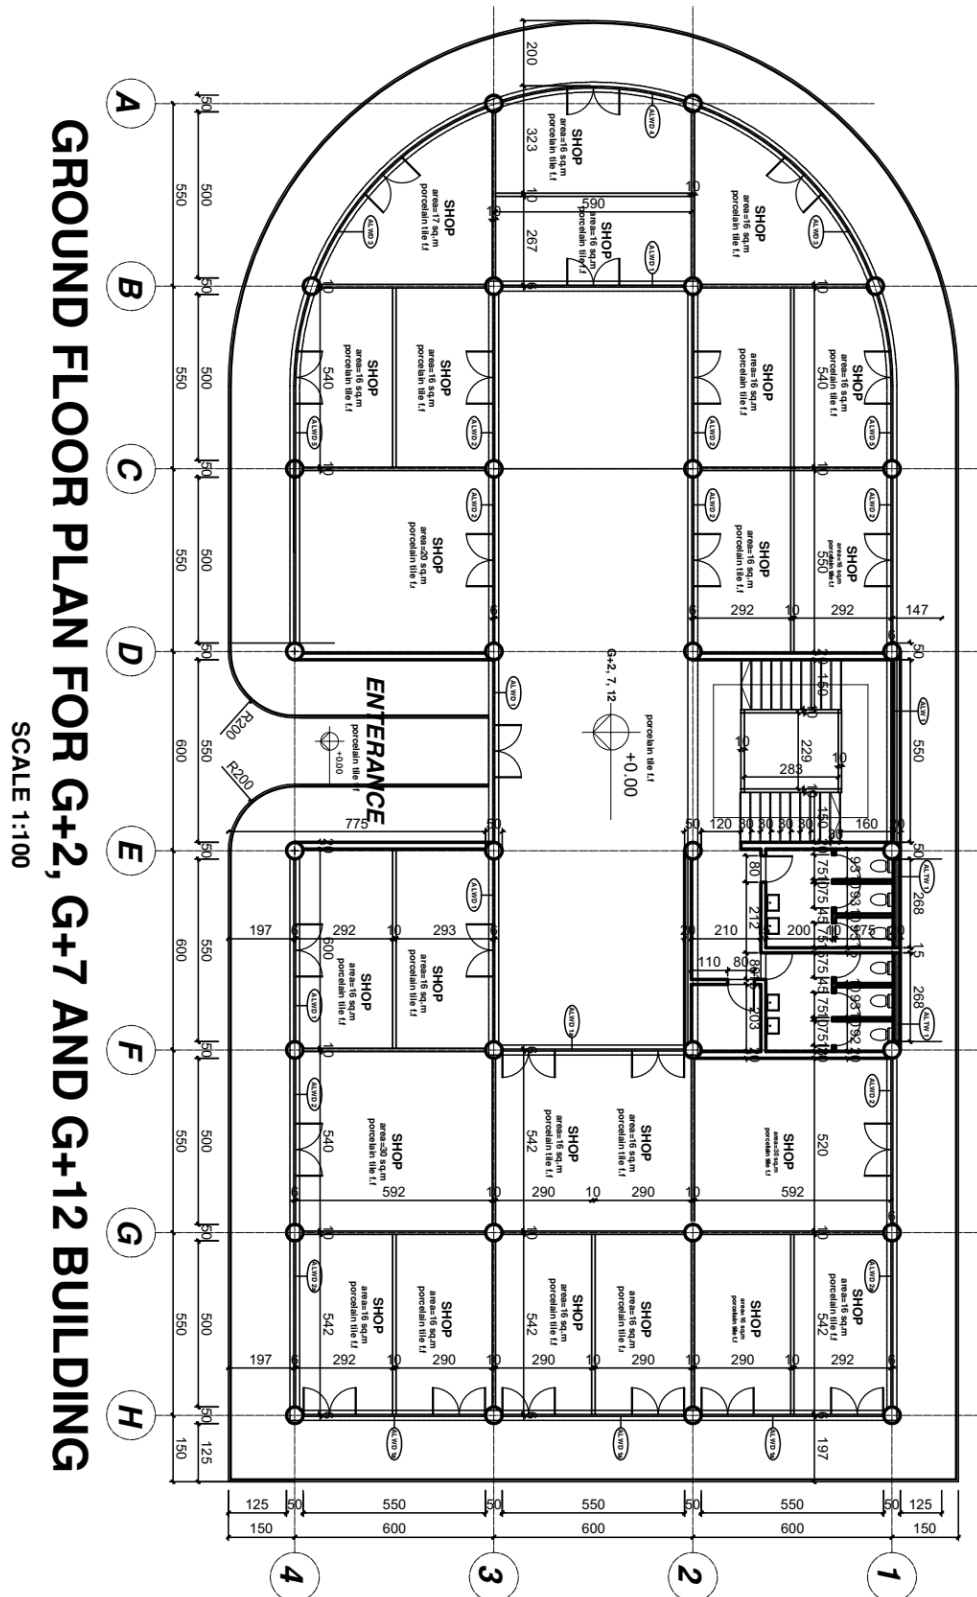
Ground floor plan for G+2, G+7 and G+12 Buildings
